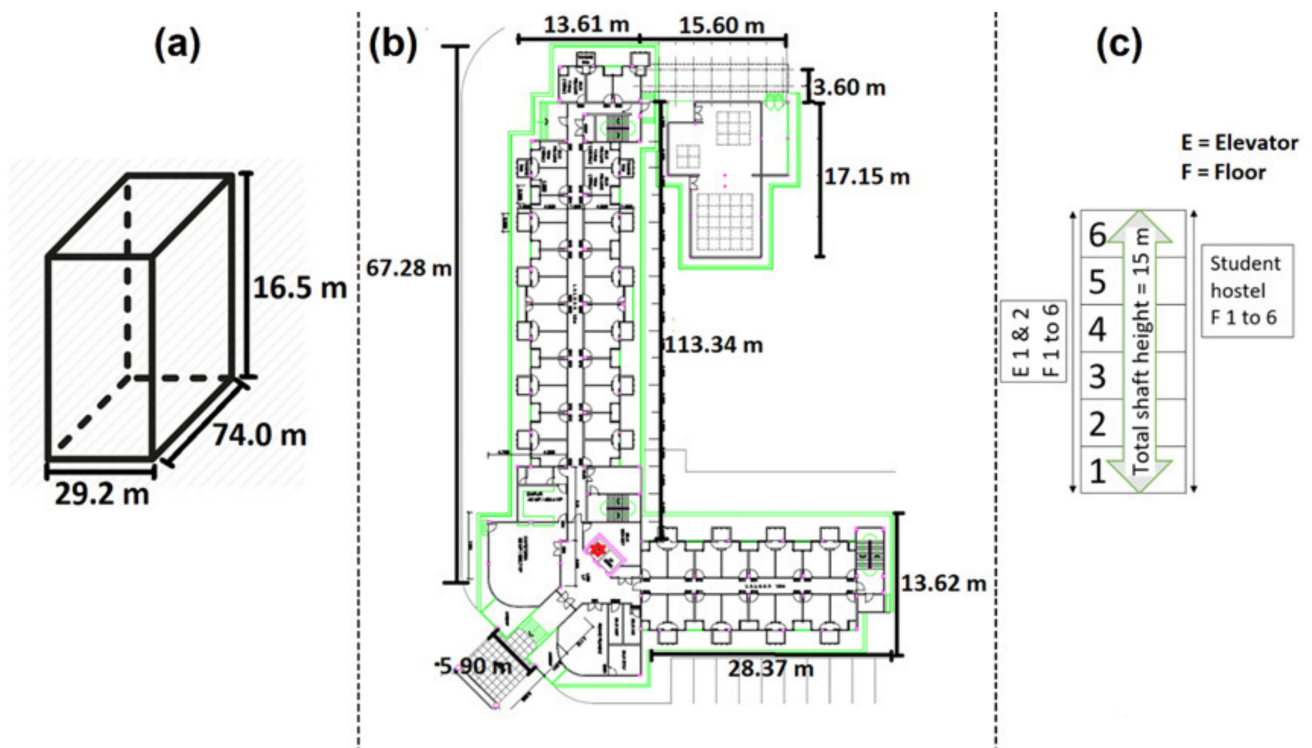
LA (a) building dimensions, (b) building floor plan, and (c) function and operating lift of different floors.
